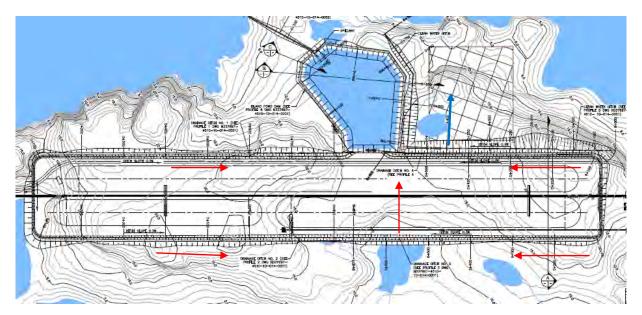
Ore Stockpile Platform Stormwater Management System
